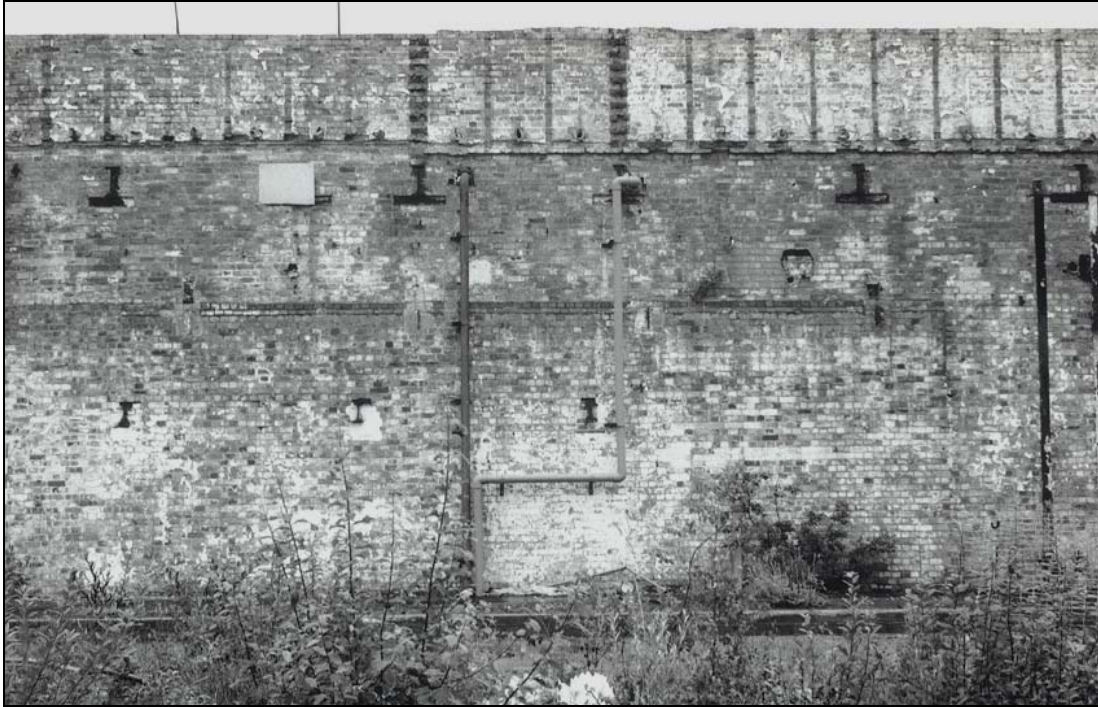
Central area of south elevation showing cut off remains of steel joists and spreader plate, brick returns and other 'T' bar supports.
